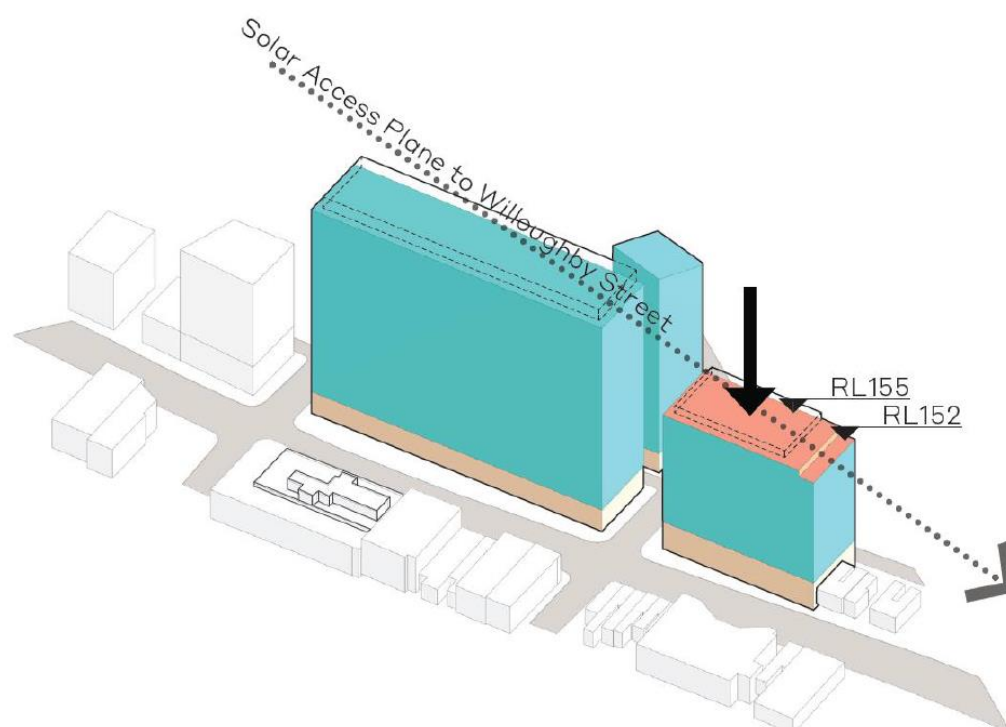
Site B services zone in response to fall in topography and sun access plane
